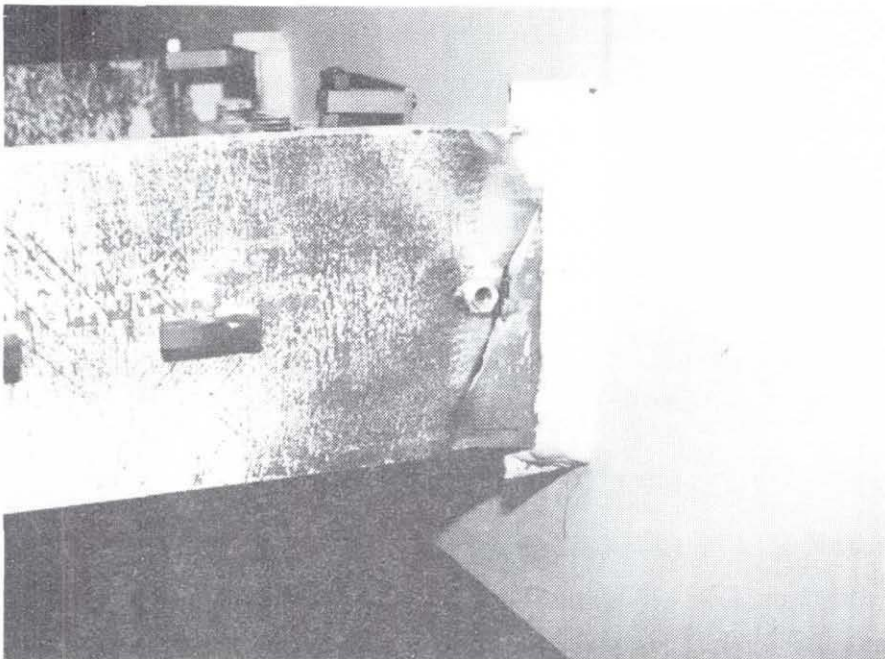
Top Flange Cracked at the Center of The Flange (Specimen 13)
